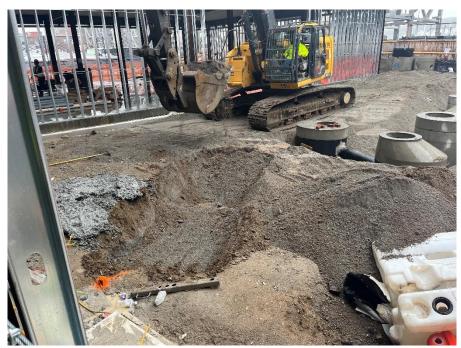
Bauer excavating for utility conduit installation in the south-central part of the site (facing east)
